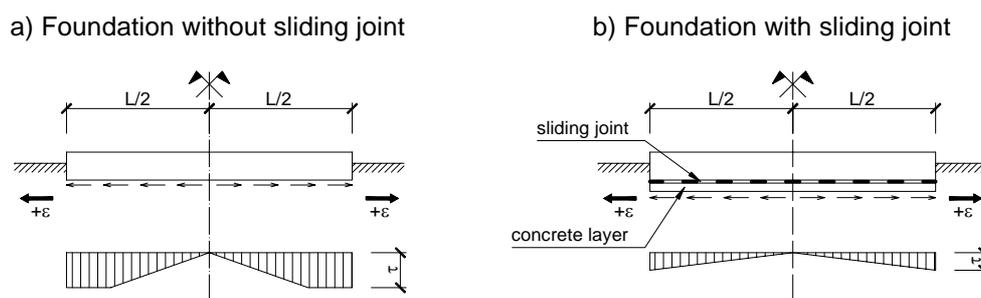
Foundation Structure on the Subsoil Exposed to Strain:
